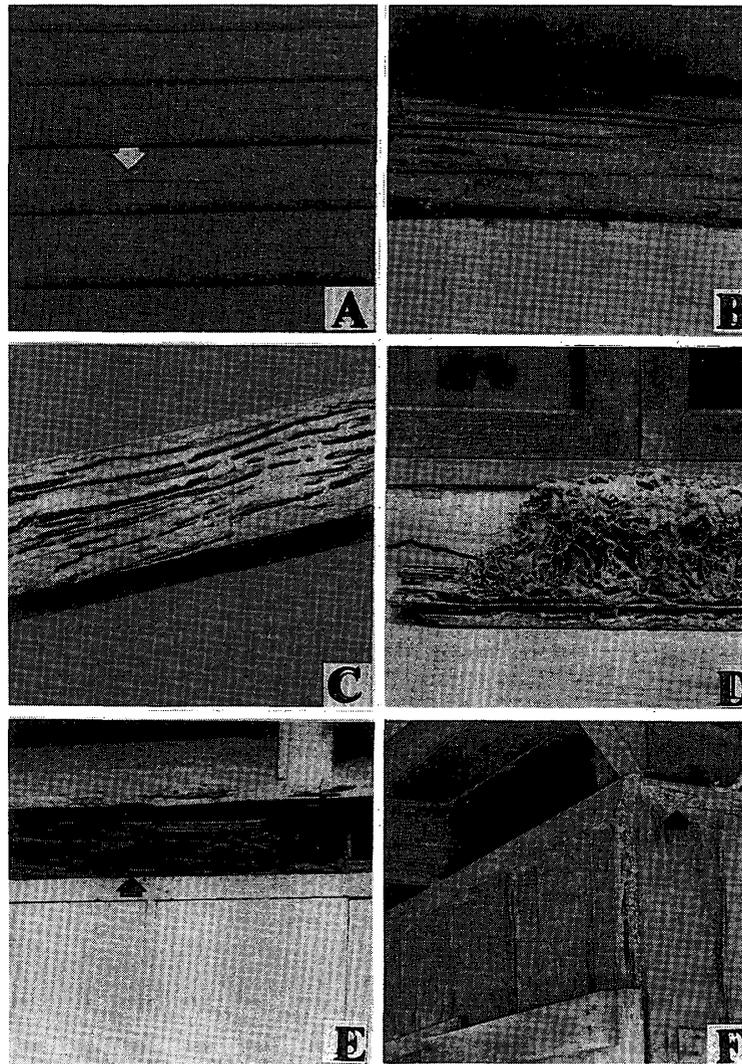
Damaged wooden structures caused by *C. gestroi*. A: Wood siding was eaten inside scarcely showing surface opening, B: Inside of damaged wood siding, C: Infested wood showing the excavation of galleries that follow along the grain of wood, D-F: Heavy damage on wall, wall beam and window head board. After severe attack, space was filled with soil and saliva cement to form spongy like structure.
